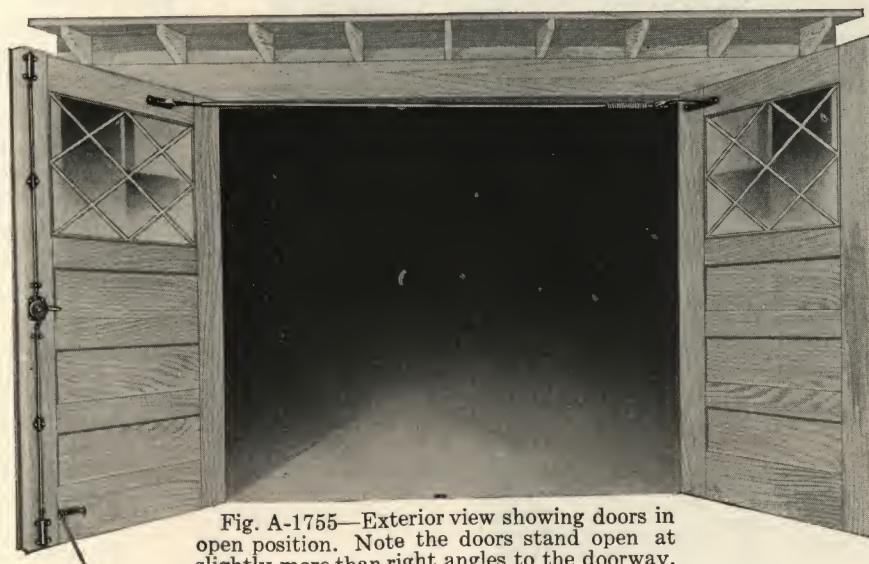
Exterior view showing doors in open position. Note the doors stand open at slightly more than right angles to the doorway.
